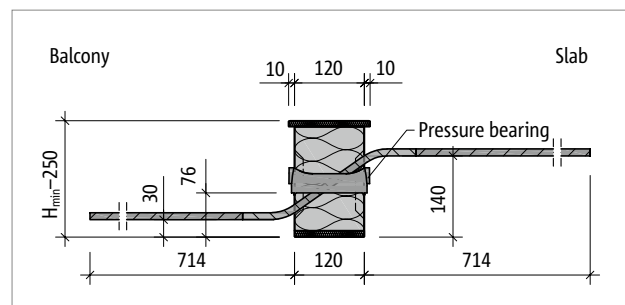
Schöck Isokorb® XT type Q-V10: Product section
